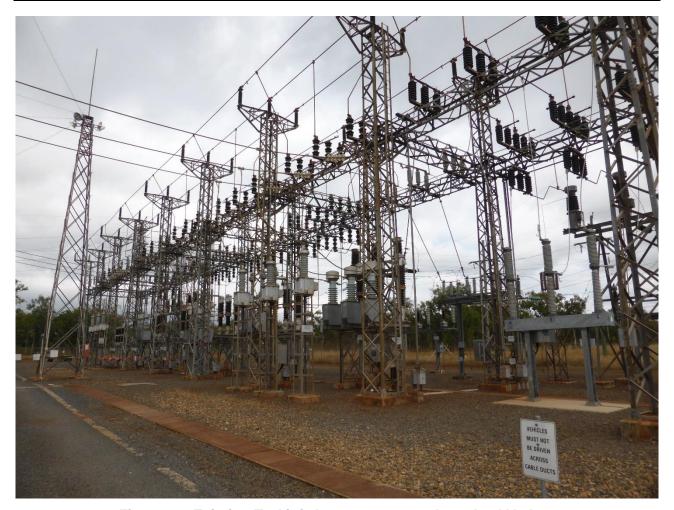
Existing Turkinje bus structure and aged 66kV plant
